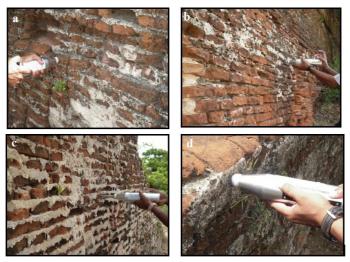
Performing Rebound hammer (NDTs) at Alamparai Fort walls: a - north wall, b - south wall, c - east wall, d - west wall
